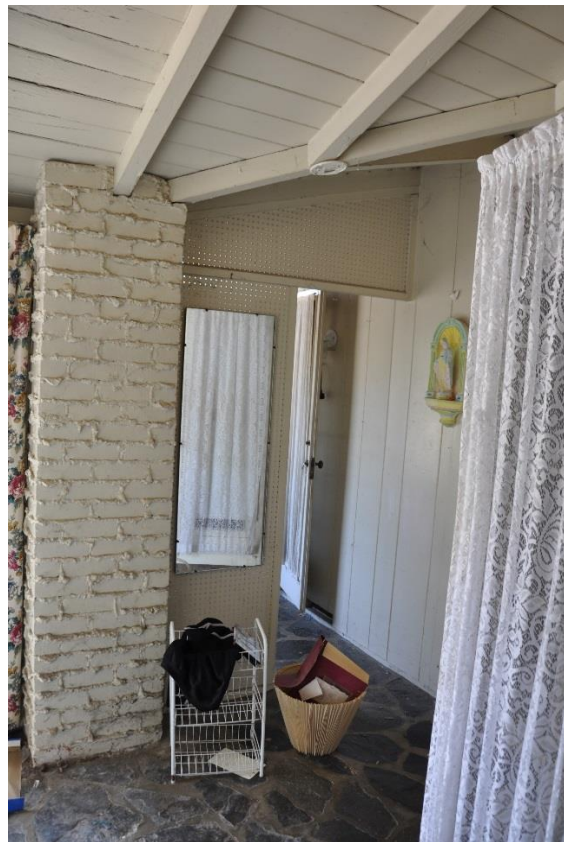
Enclosed rear (east) porch extending around the corner toward the south leg.
